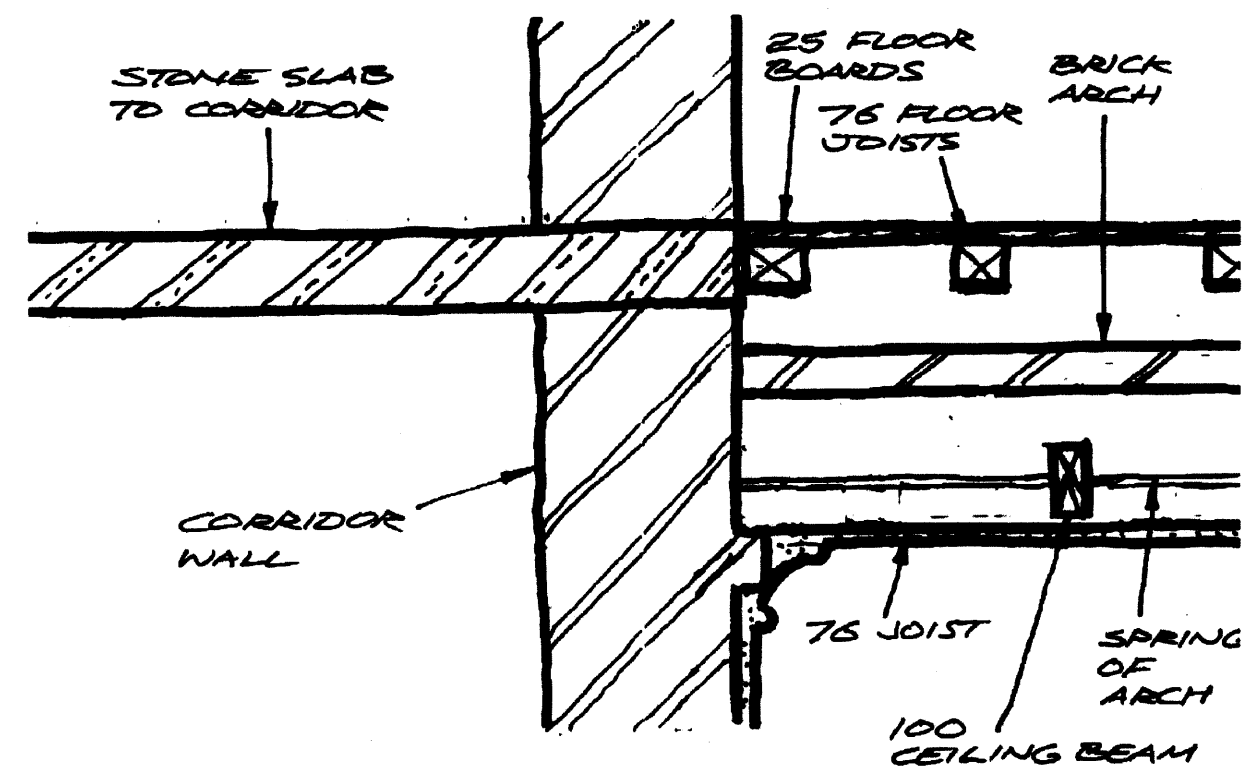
Room/Corridor interface through crown of brick arch (SK083)
